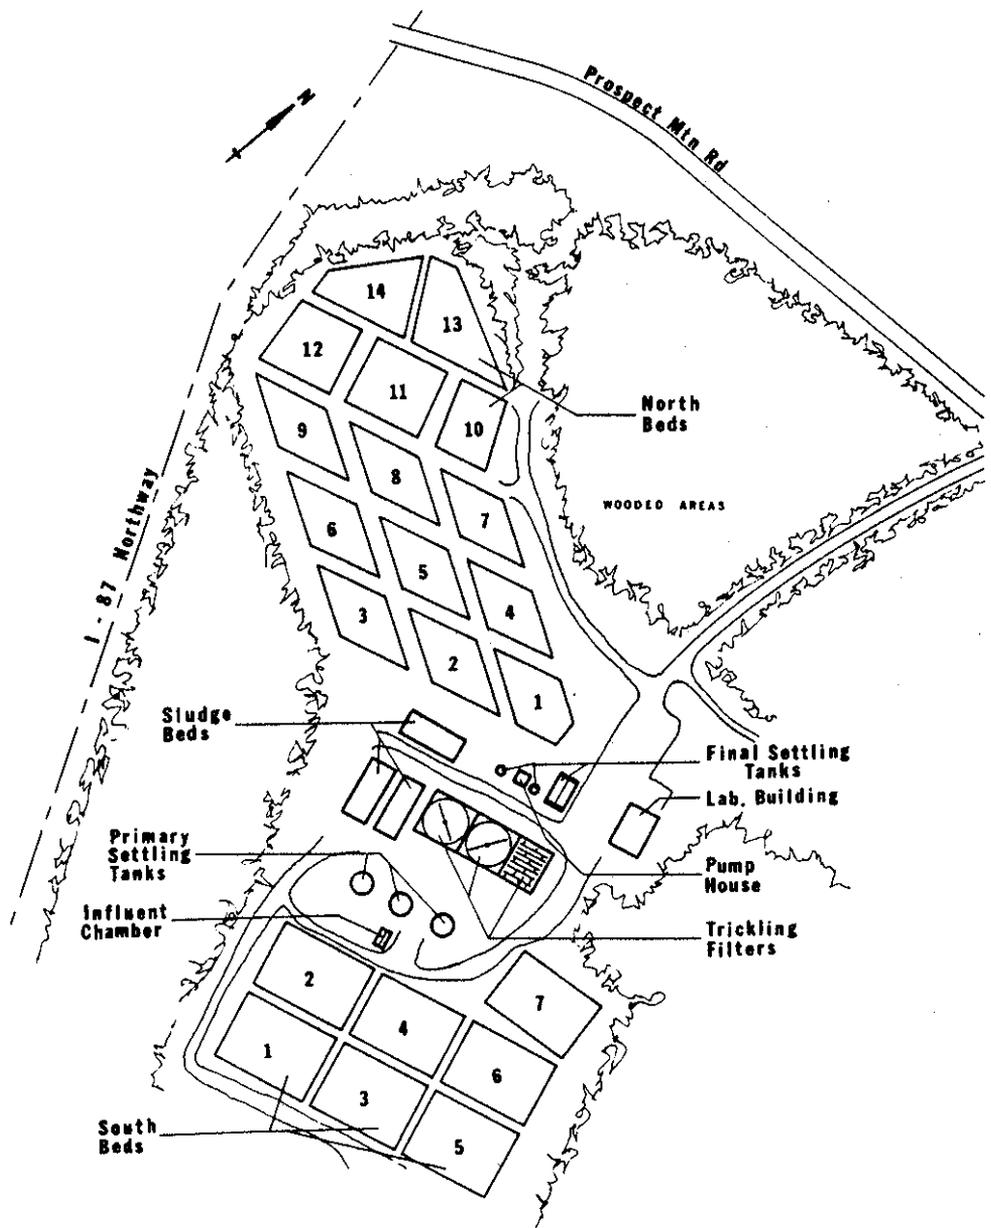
Plan of the Lake George Village Sewage Treatment Plant.
